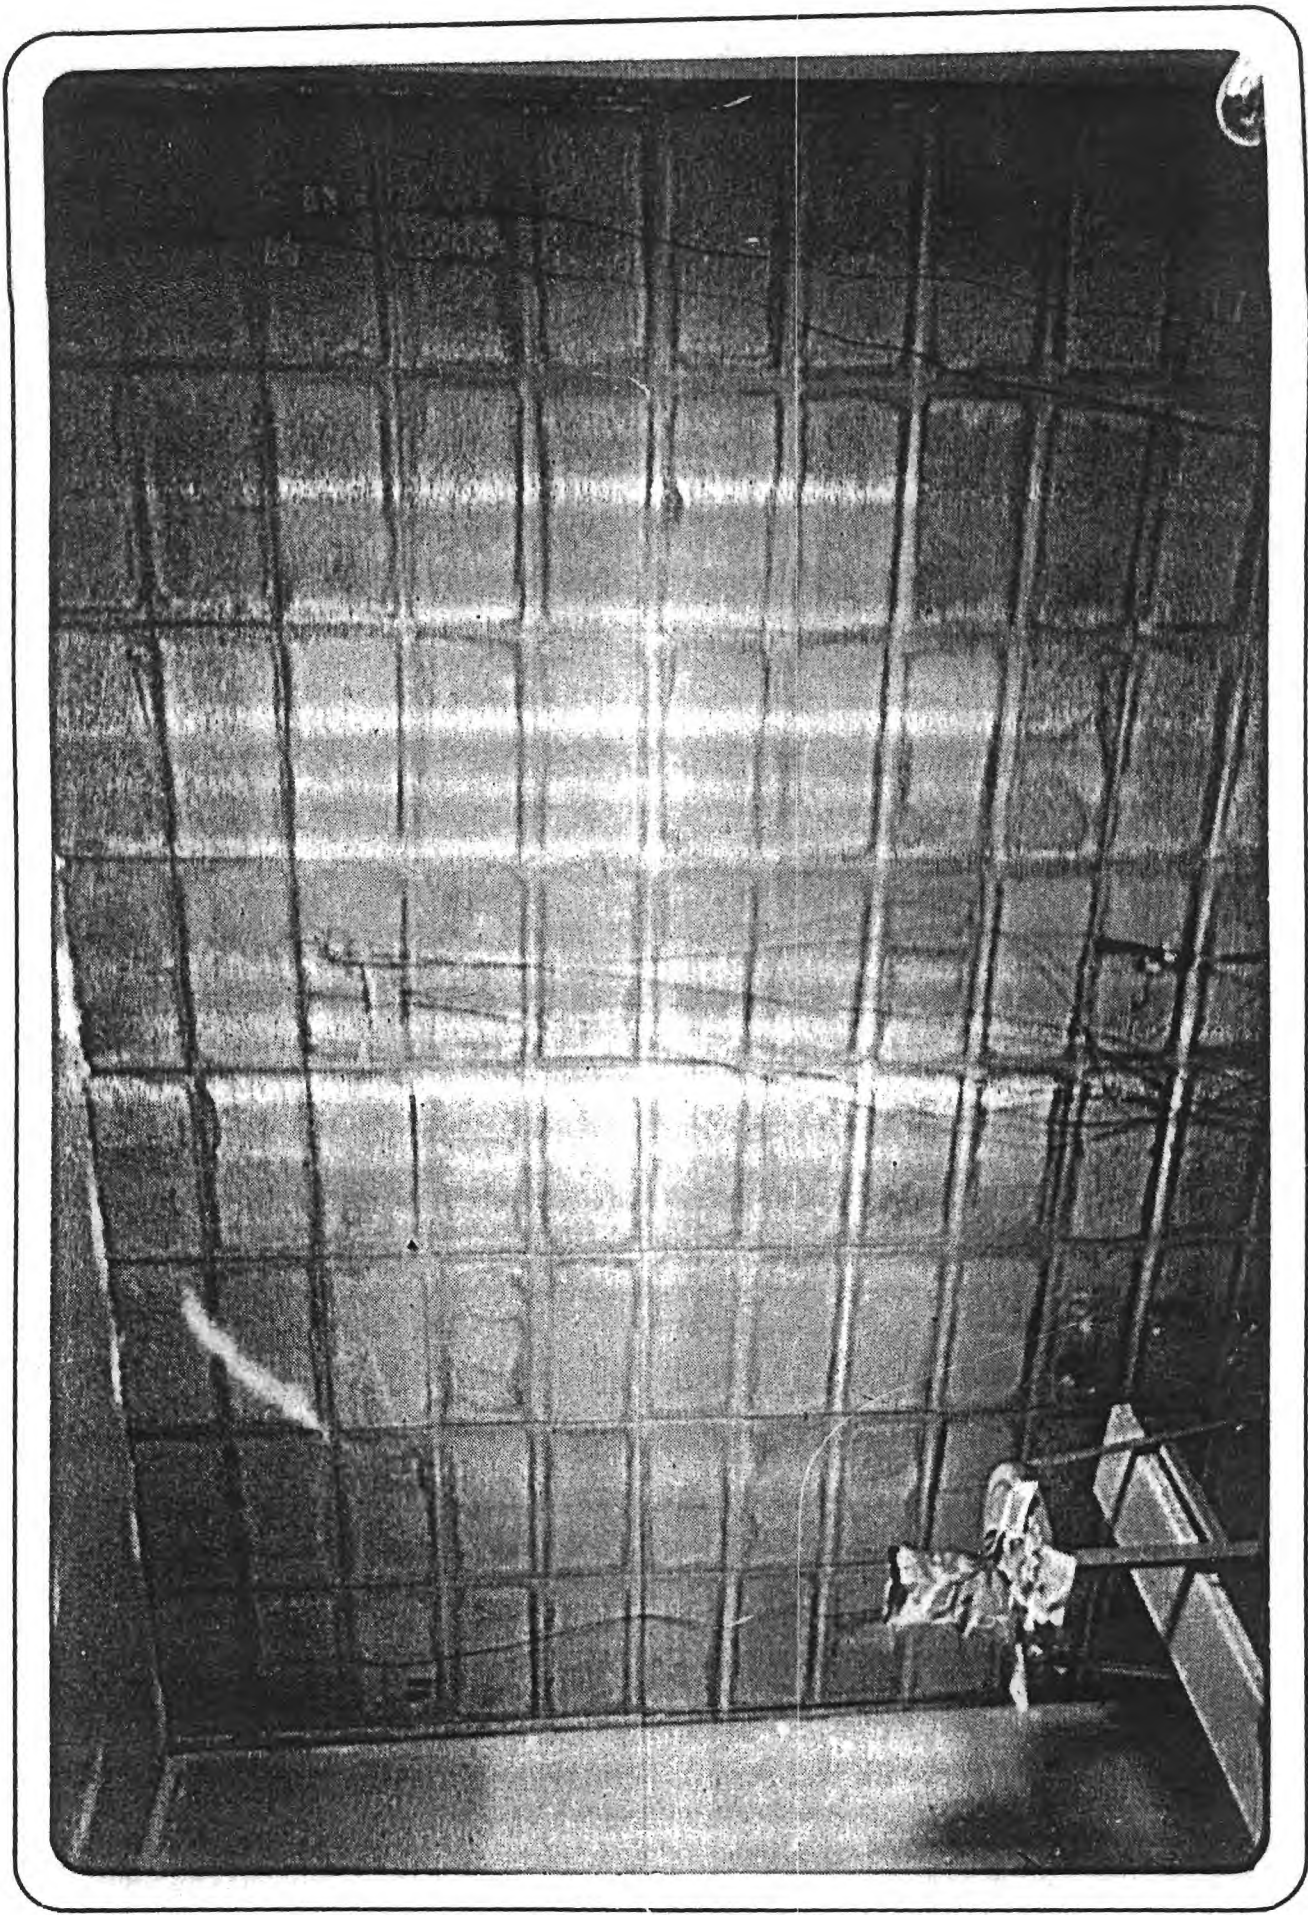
PHOTOGRAPH OF FULL SIZE TEST WALL
